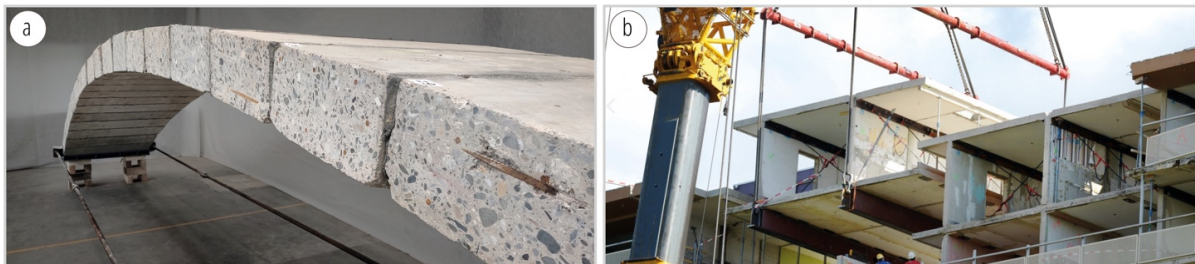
Projects reusing small (a) or larger (b) pieces cut out of CIP RC structures.
